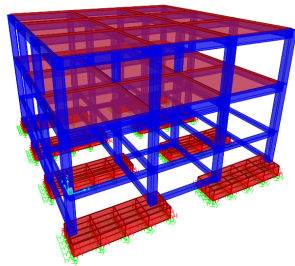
FEM model of two storey building with spring support condition in combined foundation
